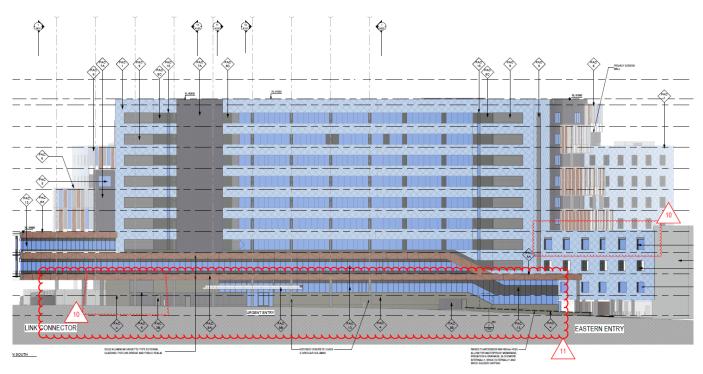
Modification 3 - Southern Elevation – addition of mechanical louvers labelled as '10'
